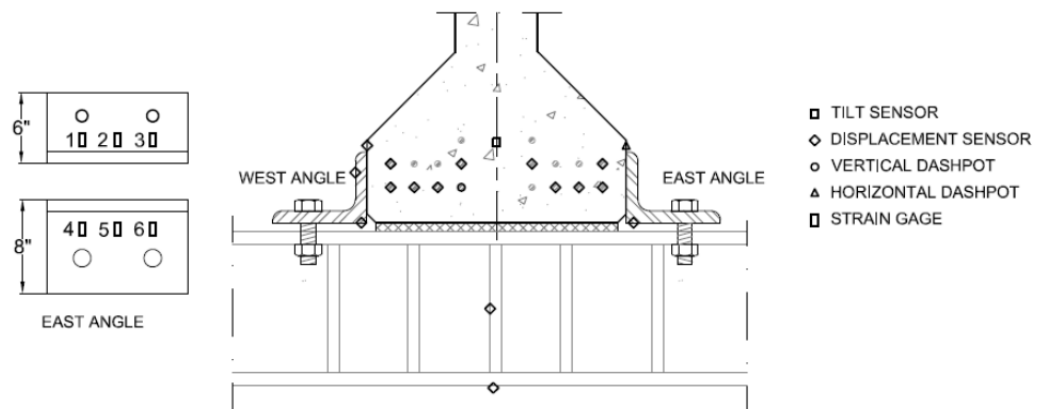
TB-2 and TB-3 Instrumentation Plan
